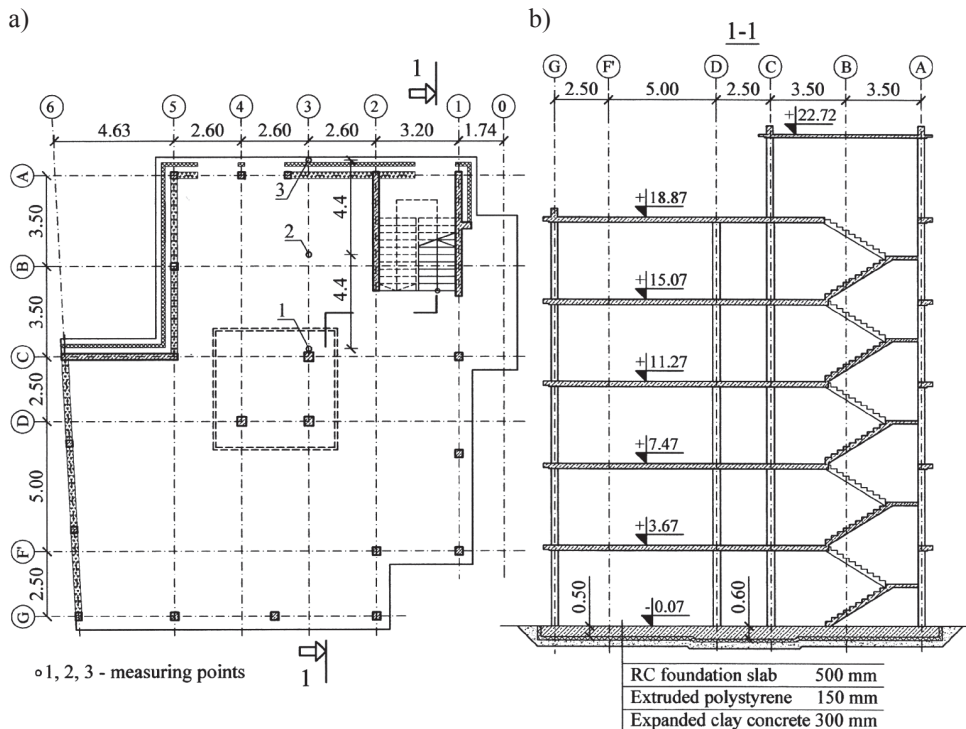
a) Structural plan of the first floor, b) 1-1 vertical cross-section
